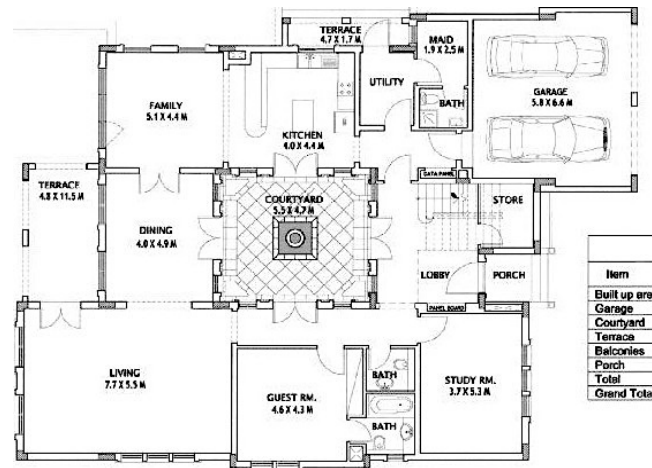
Case study Valencia villa,Ground floor.Source: [www.worldfloorplans.com](http://www.worldfloorplans.com)
